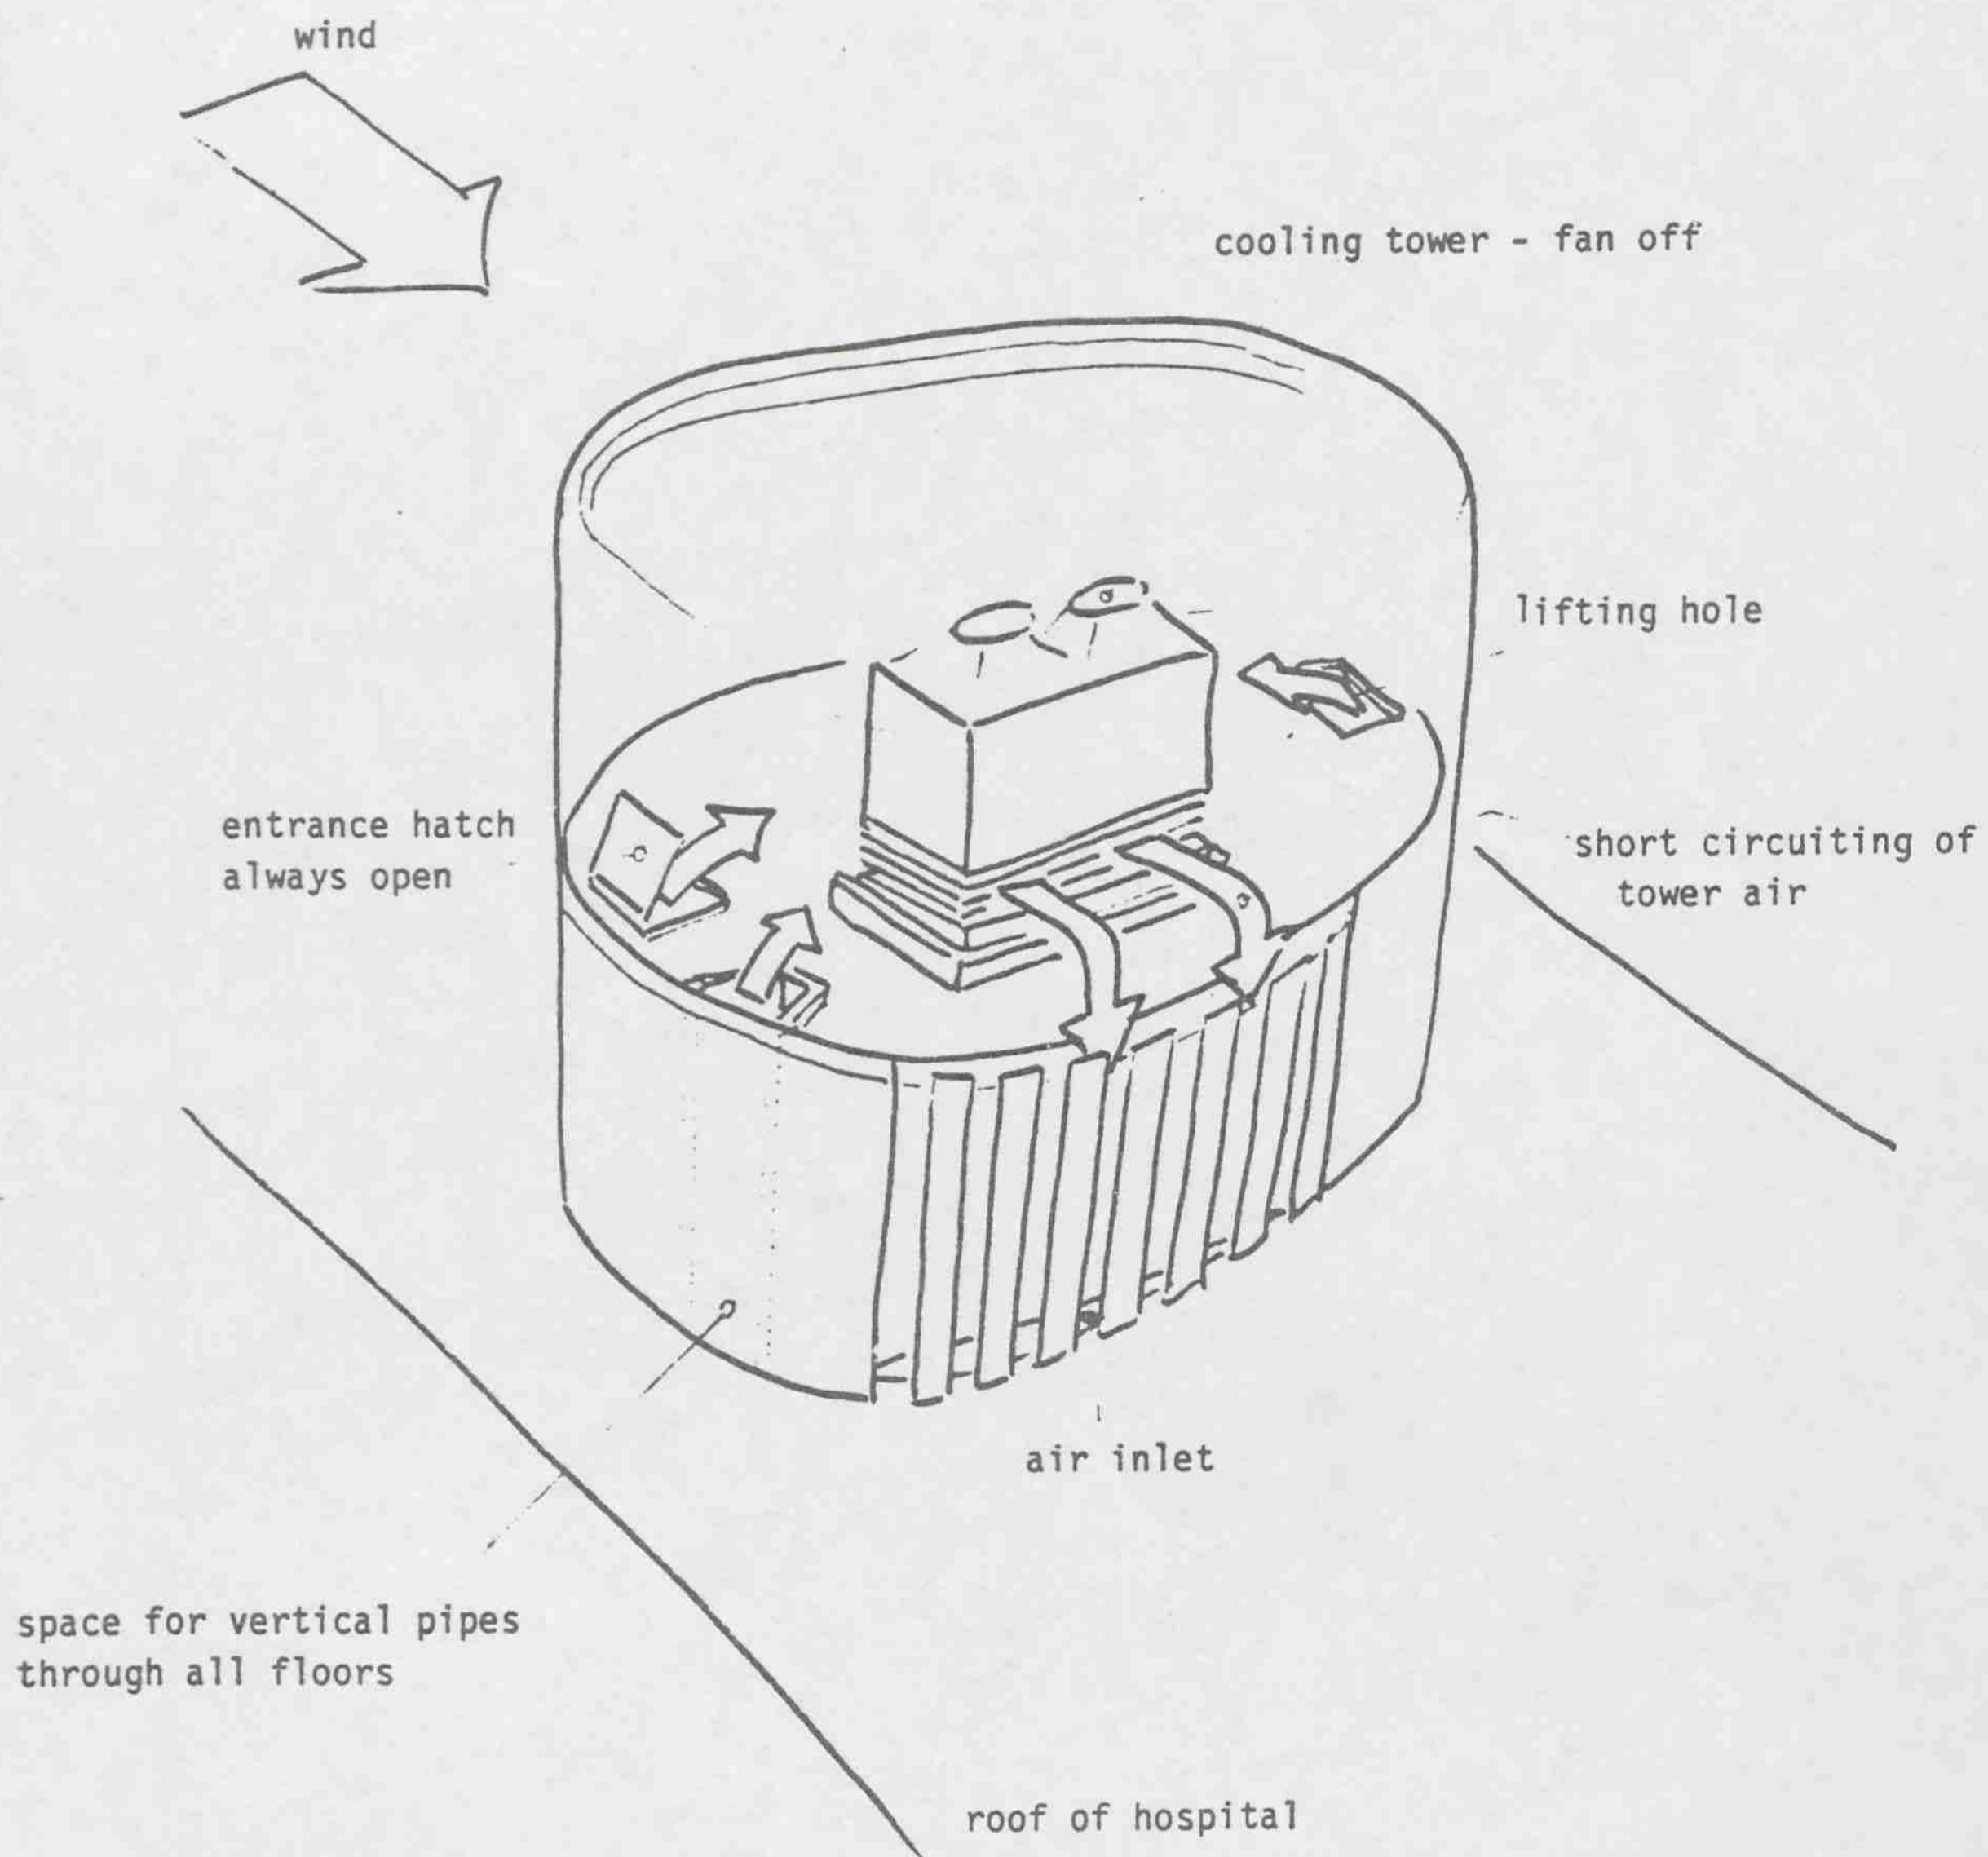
Short circuiting of air from upper plant room to air inlet when cooling tower fan is off
